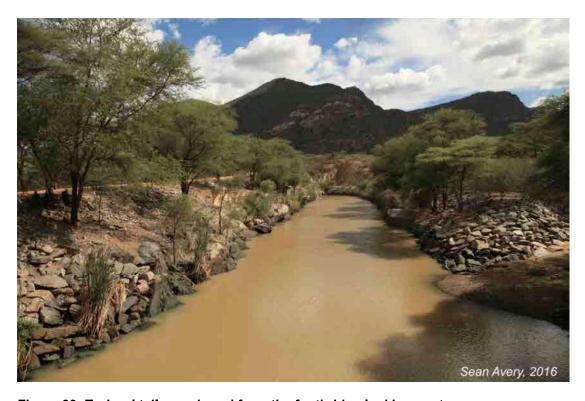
Turkwel tailrace viewed from the footbridge looking upstream
